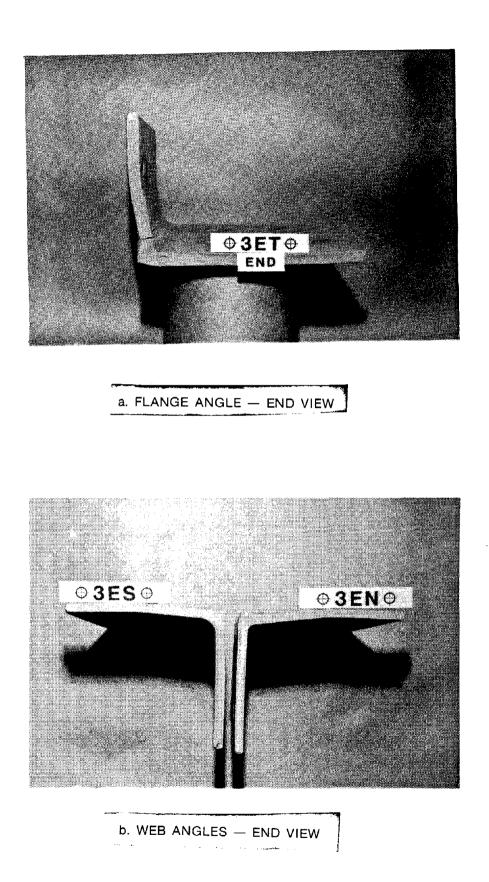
FLANGE AND WEB ANGLES FROM SPECIMEN 14CI AFTER CYCLIC TEST
